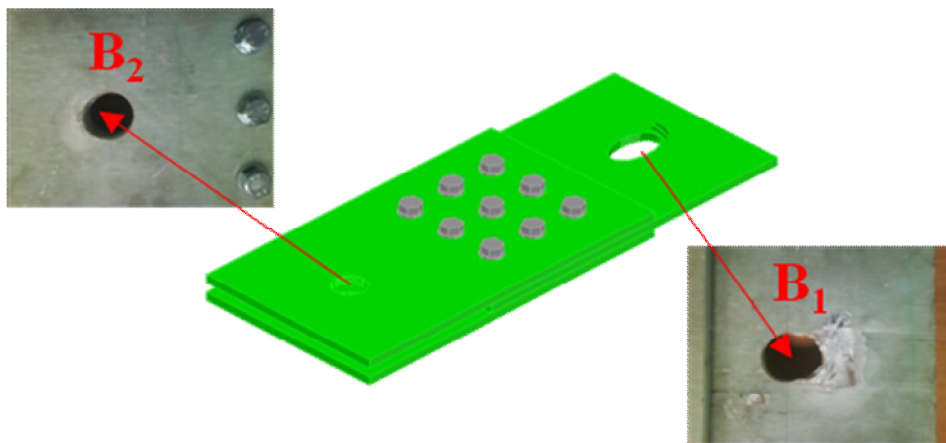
Holes B_1 and B_2 where bearing failure occurred.
